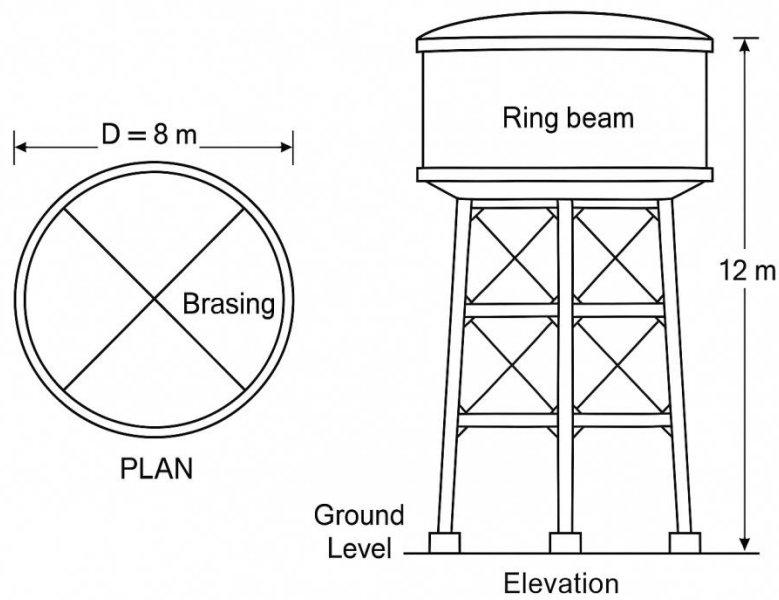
Structural layout of 250 m³ elevated RCC tank with braced staging.
